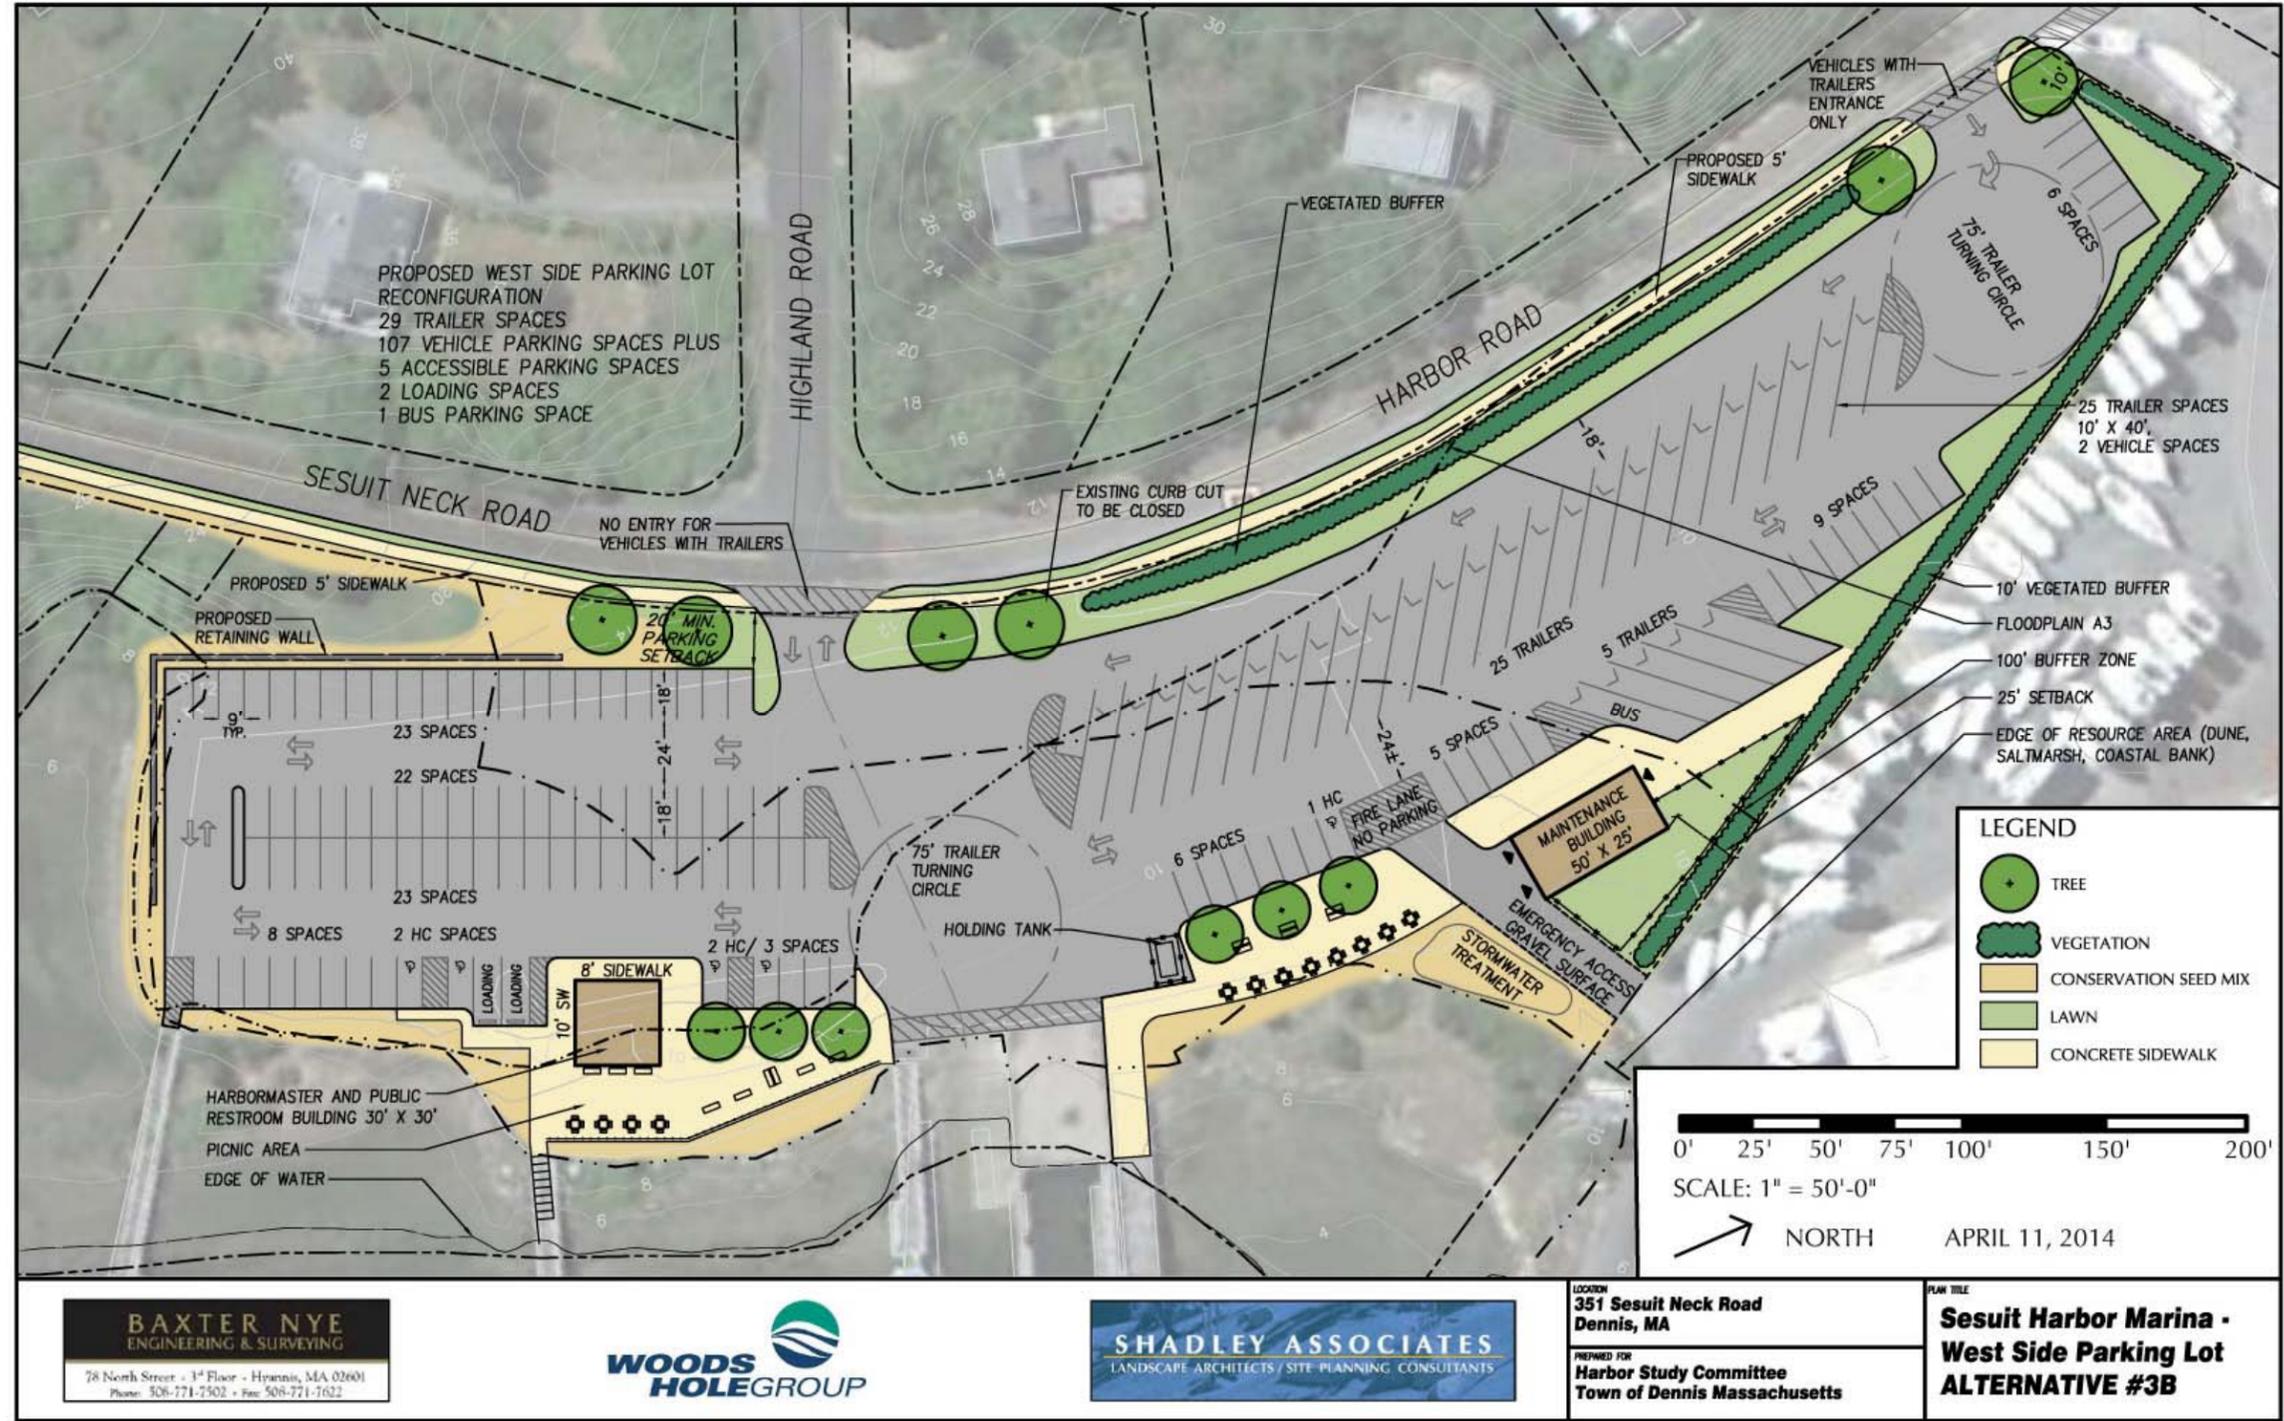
Recommended West Side Site Improvements – Alternative 3B
